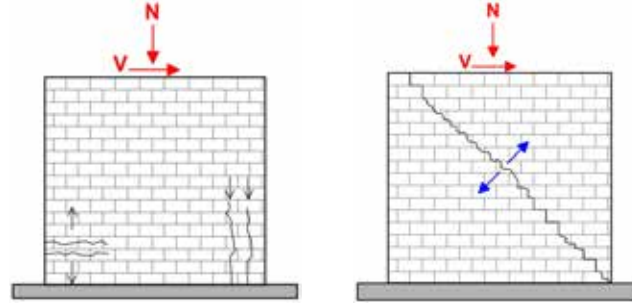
Principal failure mechanism for large dimensions panels; from left to right: (a) combined compressive and bending stress; (b) shear and diagonal traction.
